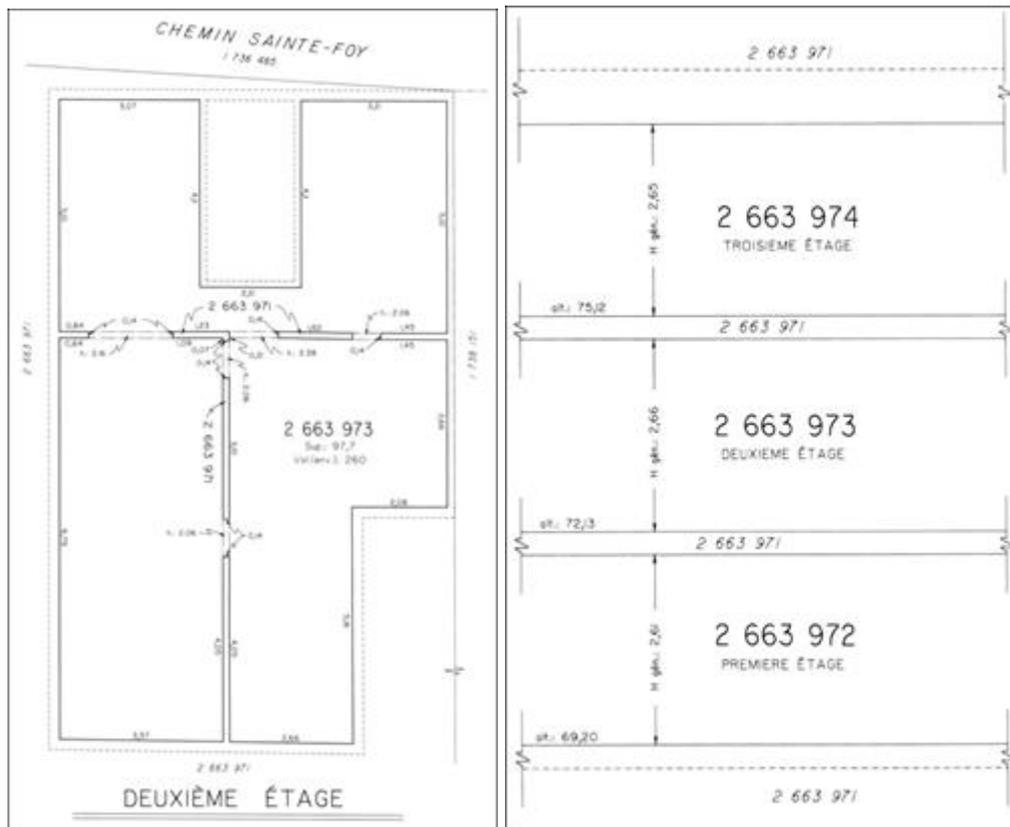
Supplementary plan of PC-11698. (Left: subdivision plan of the second floor. Right: Vertical profile)
